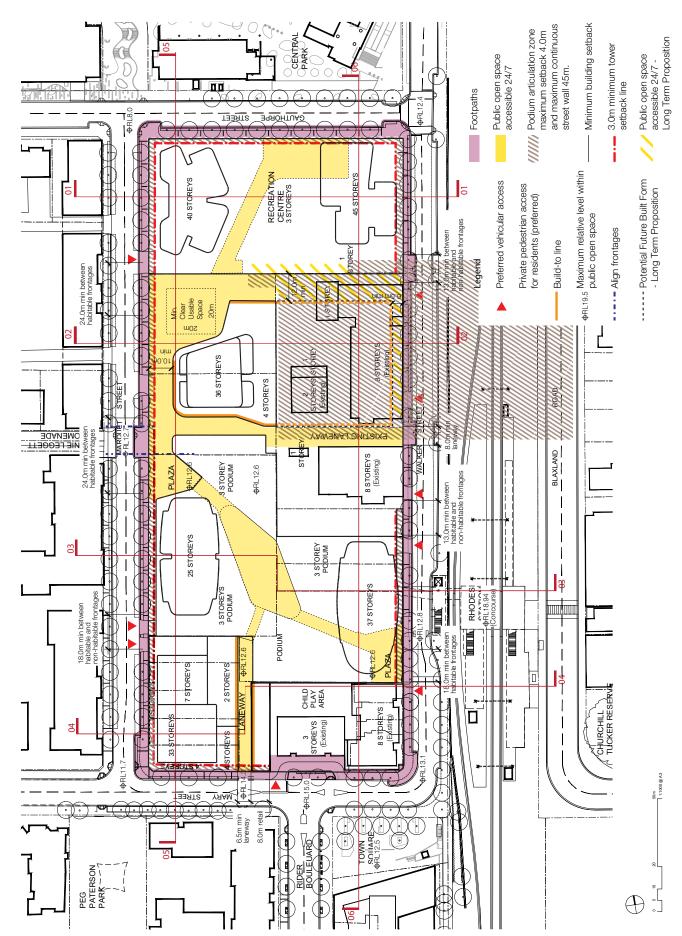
Precinct D (Station Gateway West) Master Plan
